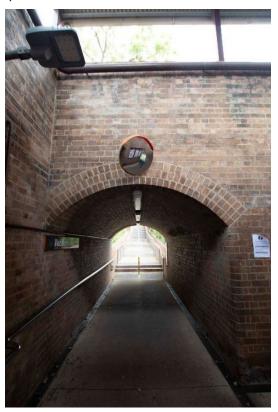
Detailed view of the existing subway entrance toward the commuter car park (view to southwest)
